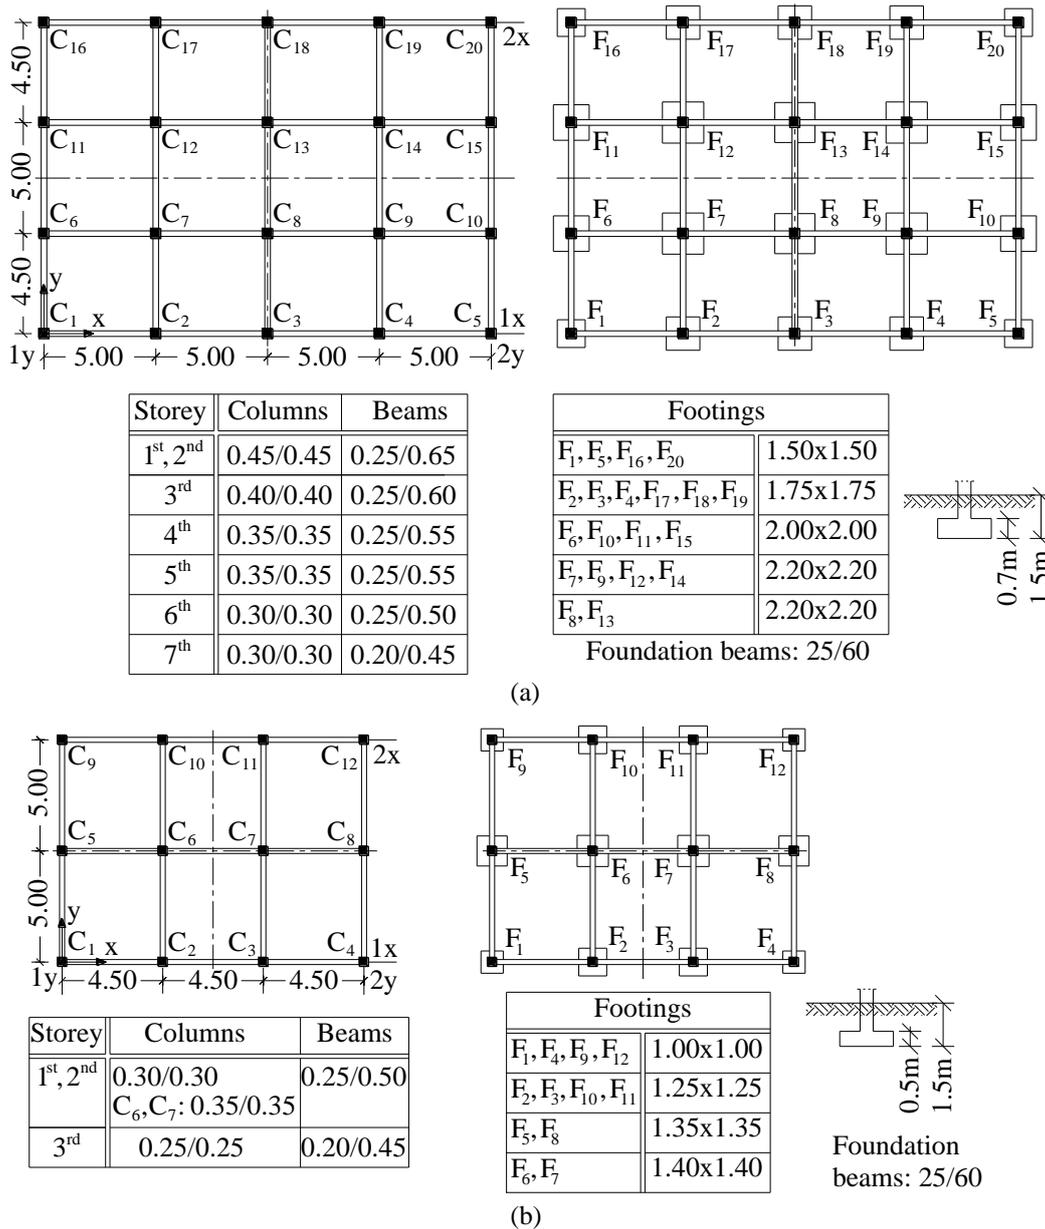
Plan-view, dimensions of the R/C members and foundation system of buildings SFxy-3 (a) and SFxy-7 (b)
